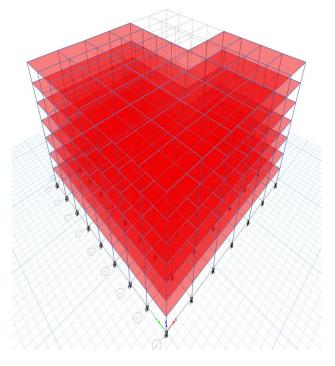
Three Dimensional view of G+6 RCC Frame Building Using FREI
